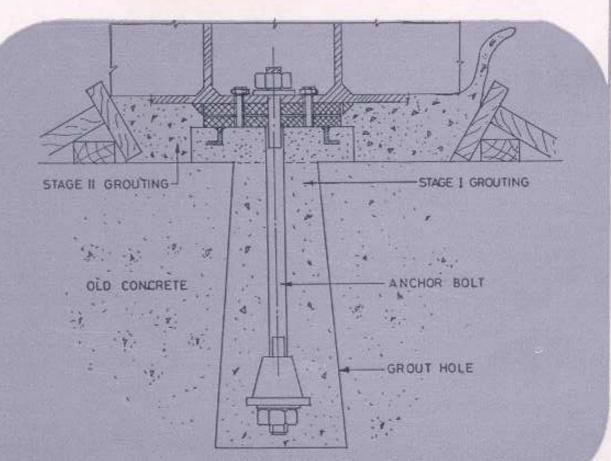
Typical arrangement for grouting machinery foundation with NS grout
